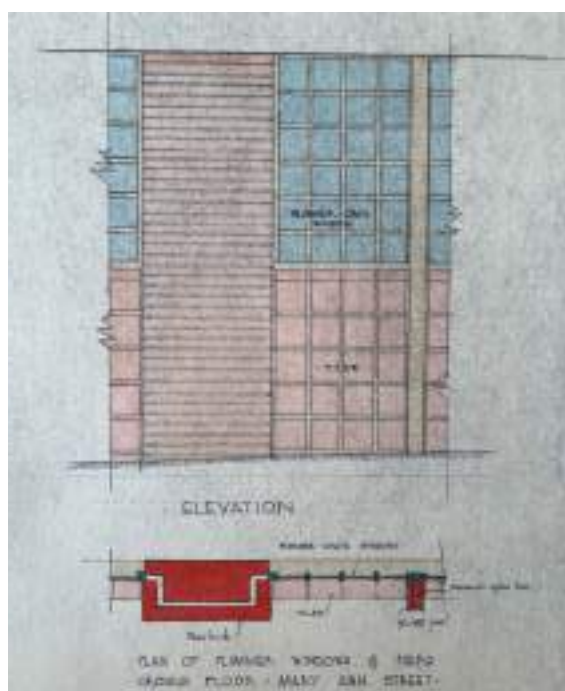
Original Plan –Plan of the 'Plummer Crete' windows and piers on ground floor of Mary Ann Street. (Source: Drawing No. 8, "The National Cash Register Co. Pty Ltd. Harris and Mary Ann Streets Ultimo ½" Scale Details," September 1952, NRS-13429-1-[Plan23509]-Plan23509, NSW State Archives, Kingswood)
